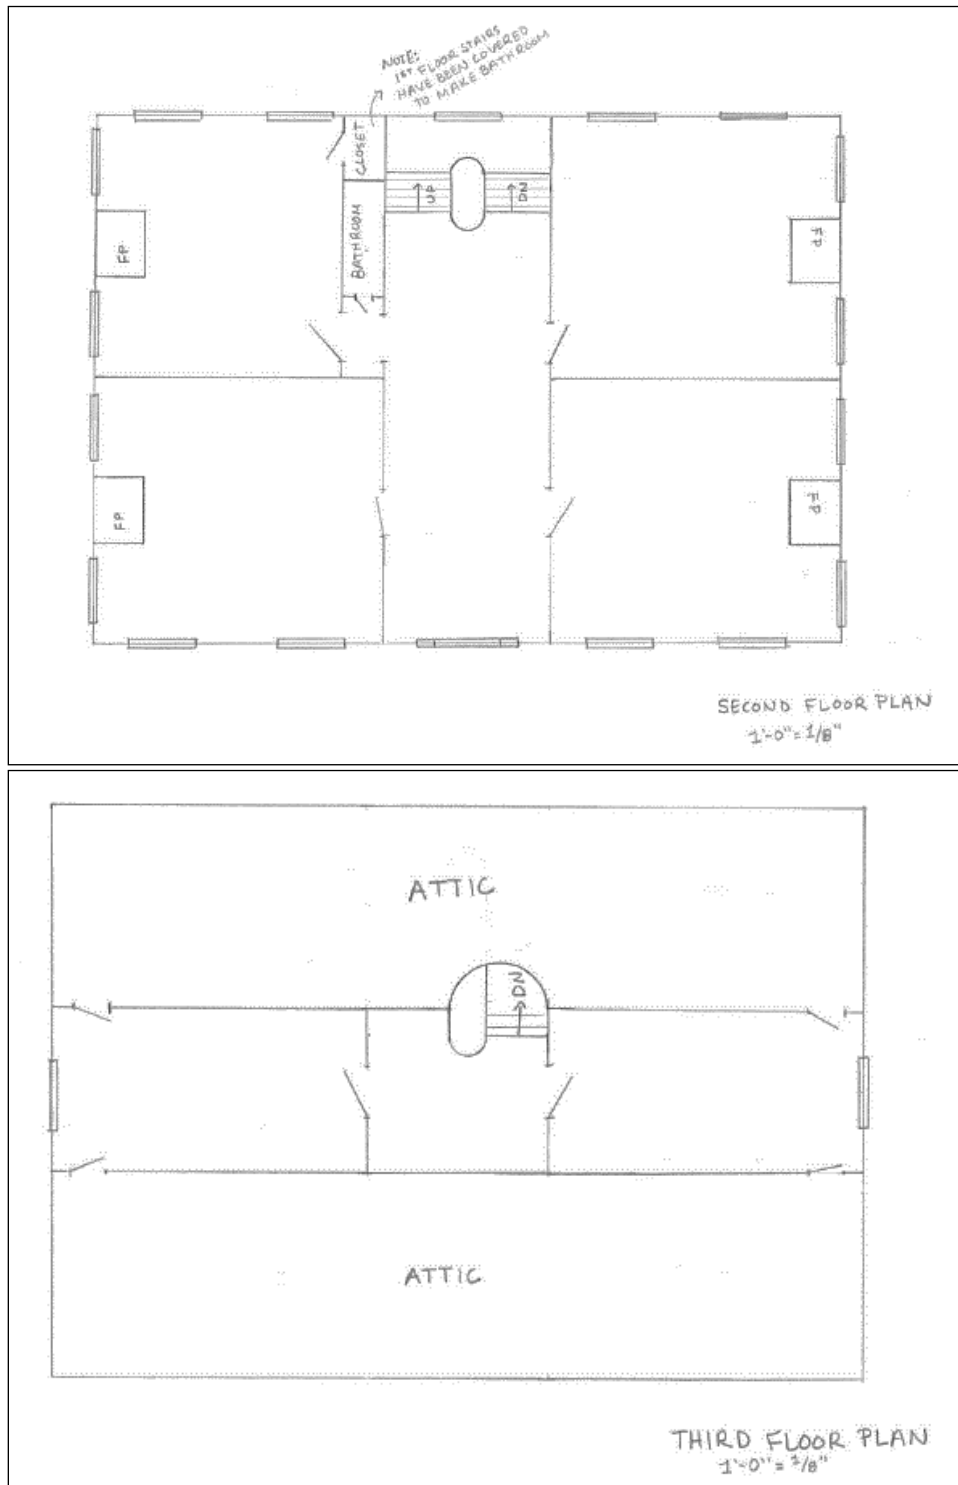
Northern-Cox House, Second Floor Plan (Top) and Third Floor Plan (Bottom).¹³⁸
